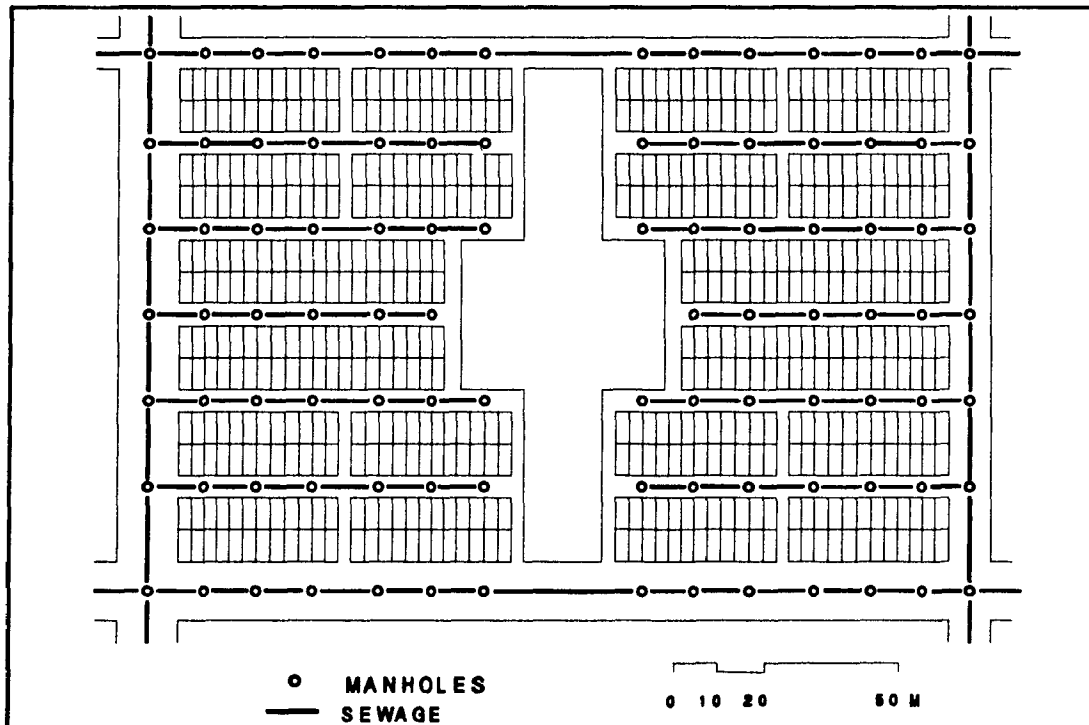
SEWAGE DISPOSAL - CONTROL PLAN
